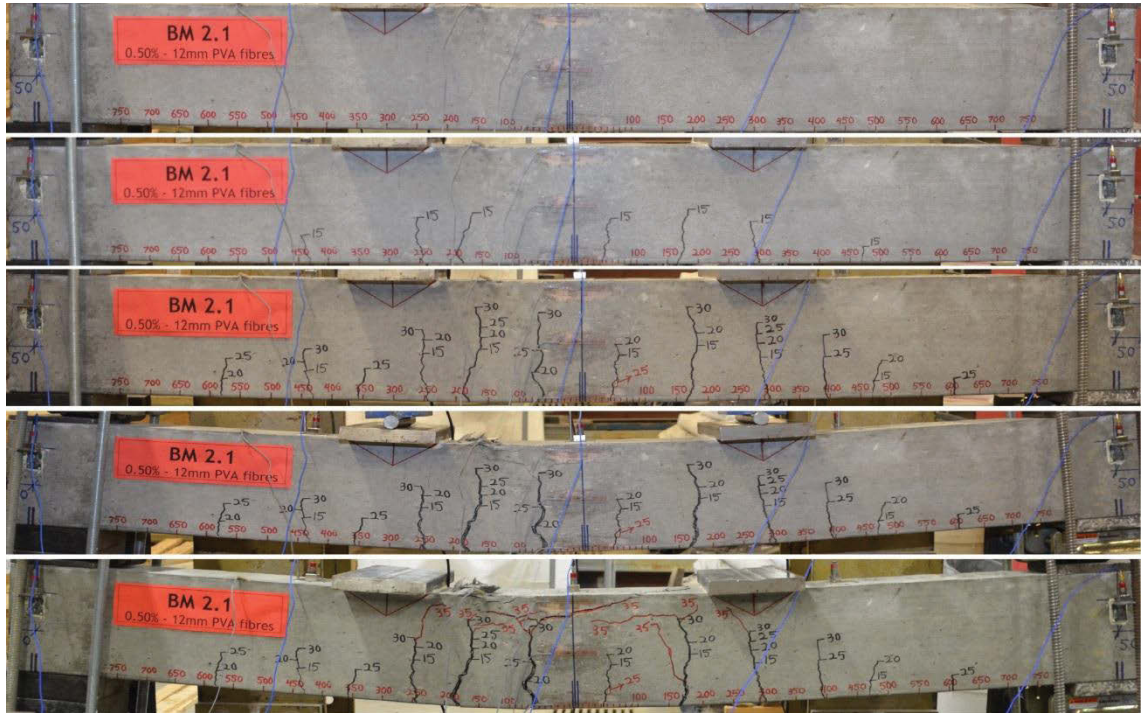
Cracking patterns of beam 12PVA0.50% (A)
